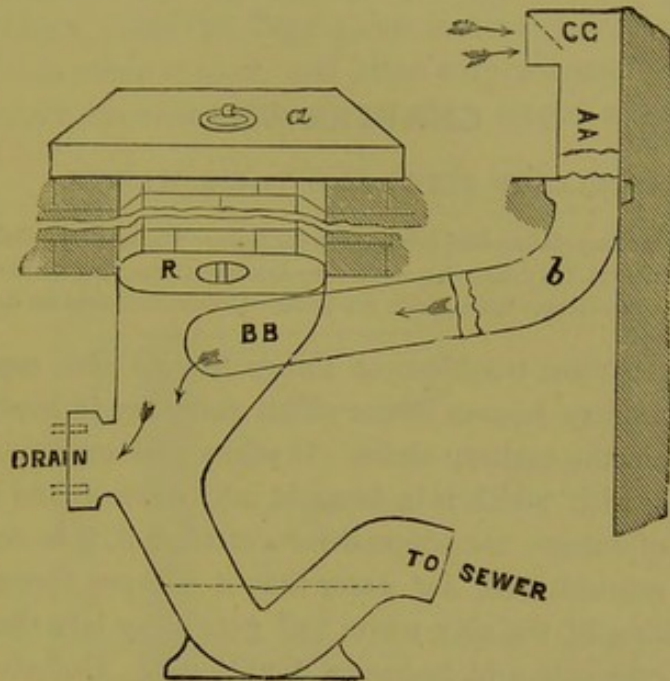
View of a 6-in. "Ventilating Drain-syphon" with Air Induct-pipe.
